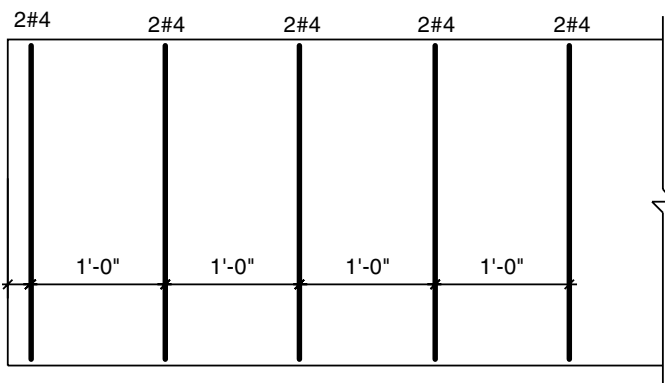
End zone reinforcement details of WA2L (no EZR) and WA2R (no EZR).
